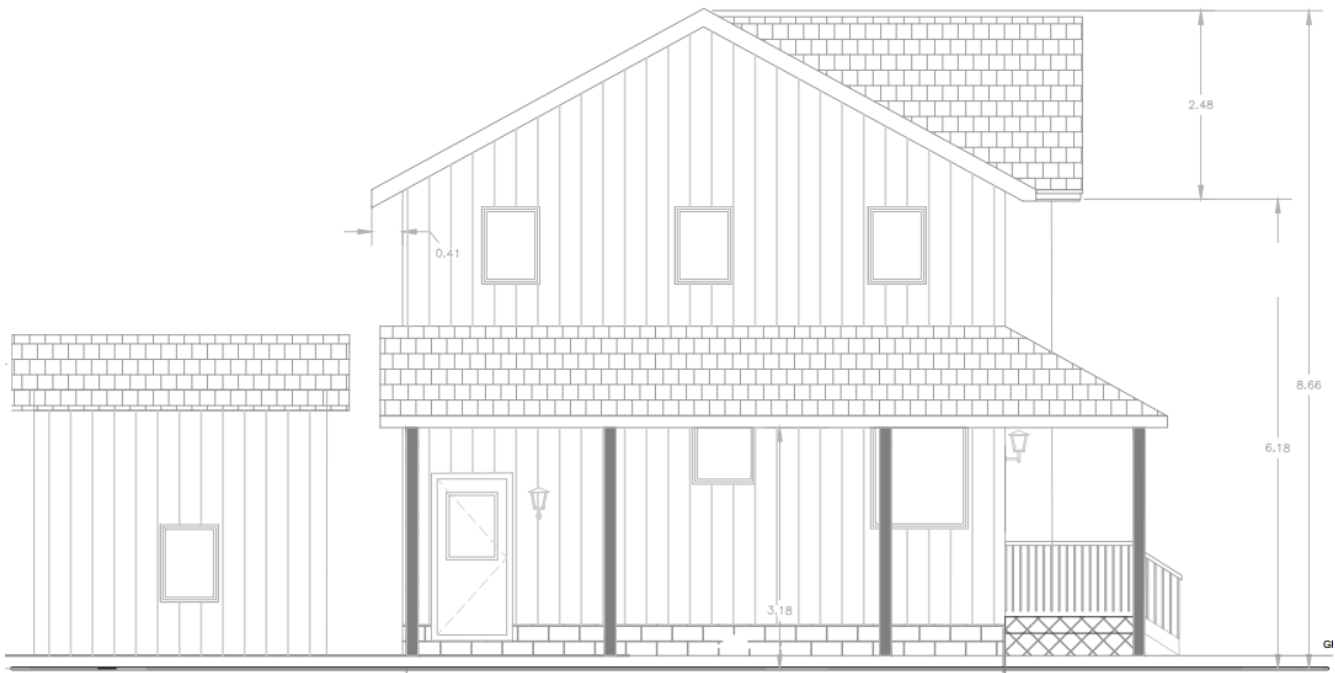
Proposed South Elevation, 40 Peter Street South. (*Image from client.*)
